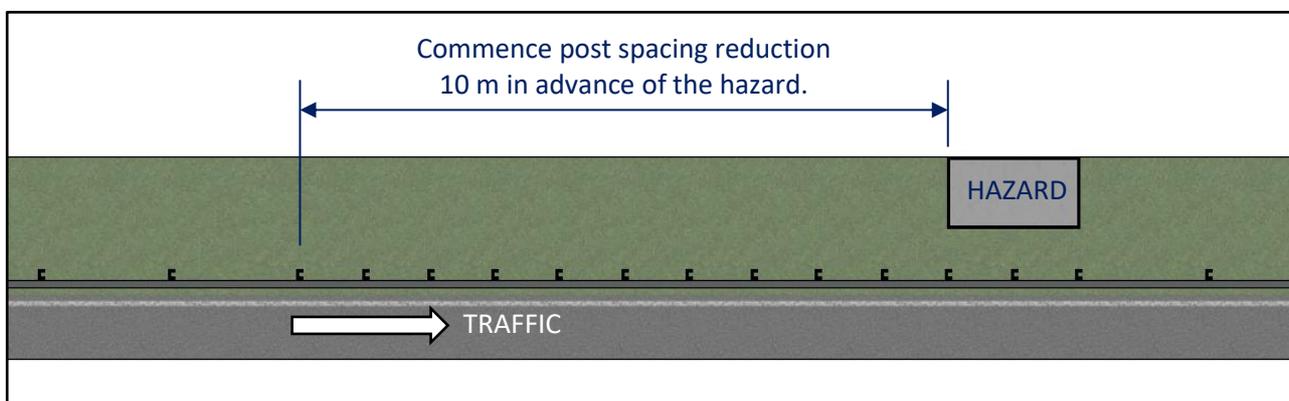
RamShield® W-Beam, Reduced Post Spacing.
